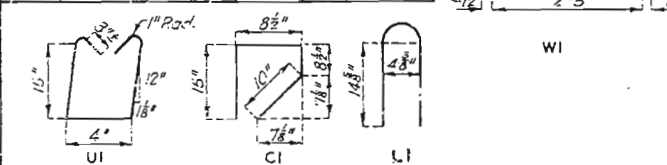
DETAILS OF MAIN CHANNEL REINFORCEMENT FOR 34'-0" SPAN
